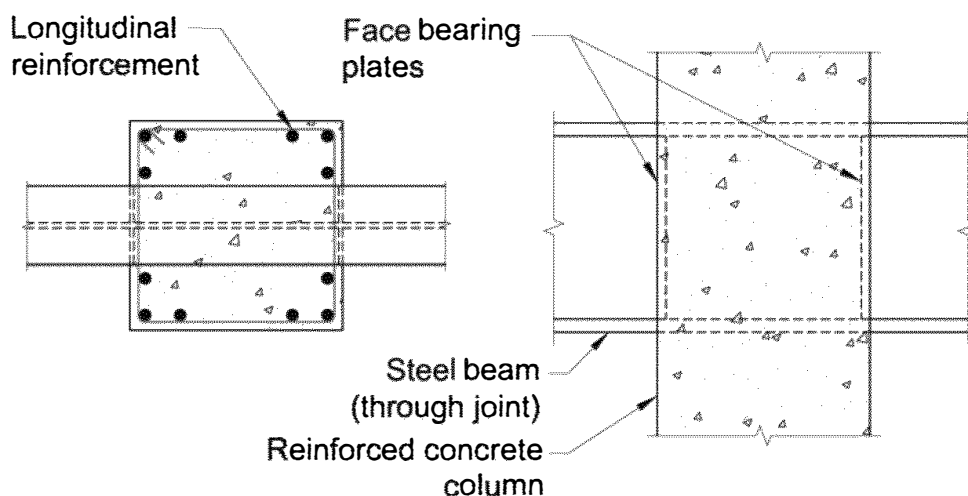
Reinforced concrete column-to-steel beam moment connection.
